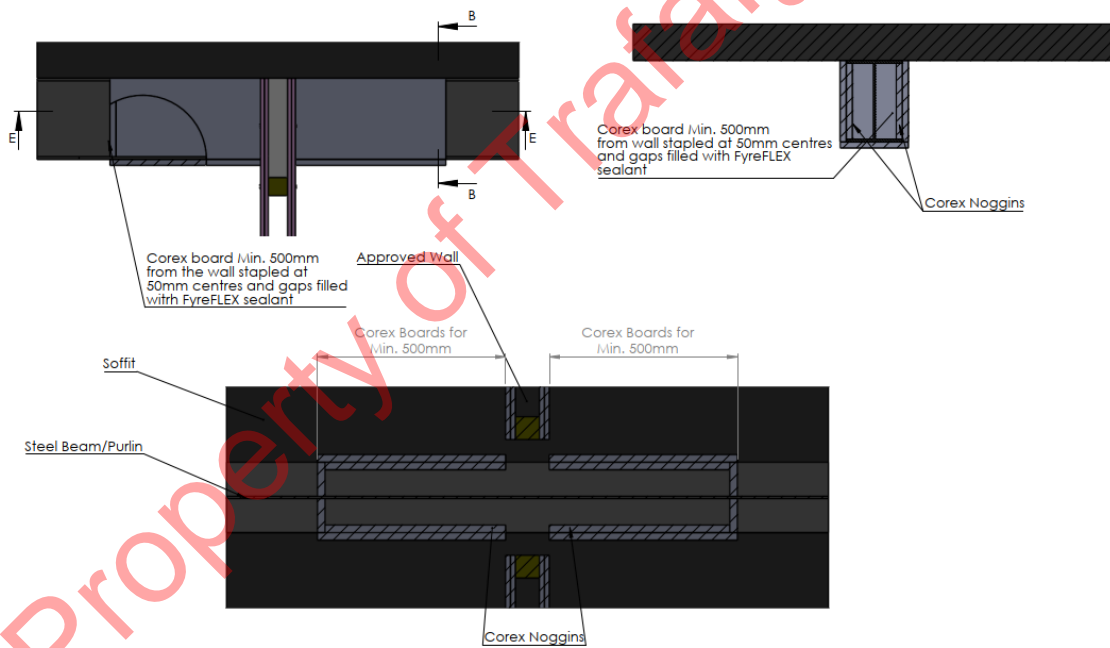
Proposed steel beam/purlin penetration system – detail 7
